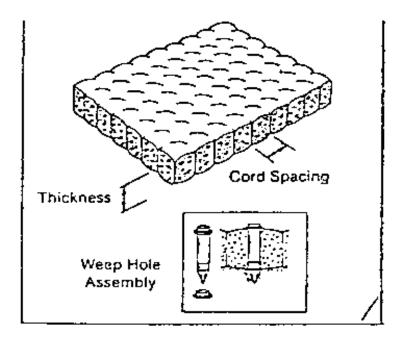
Type 2 Grouted Fabric-Formed Revetment
